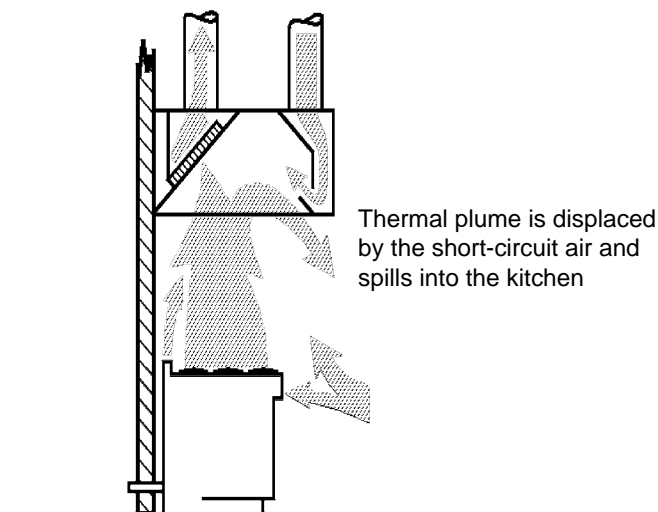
Cross-Section of Wall-Mounted Canopy Hood with Short-Circuit MUA Actually Causing Spillage
